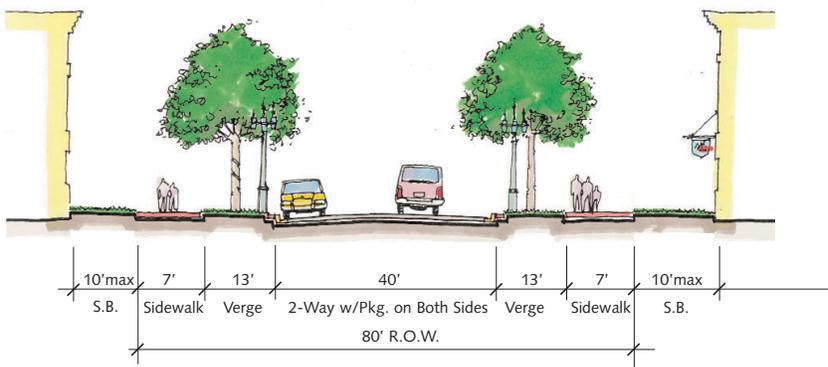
Cross Section of Proposed 9th and 10th Avenues
